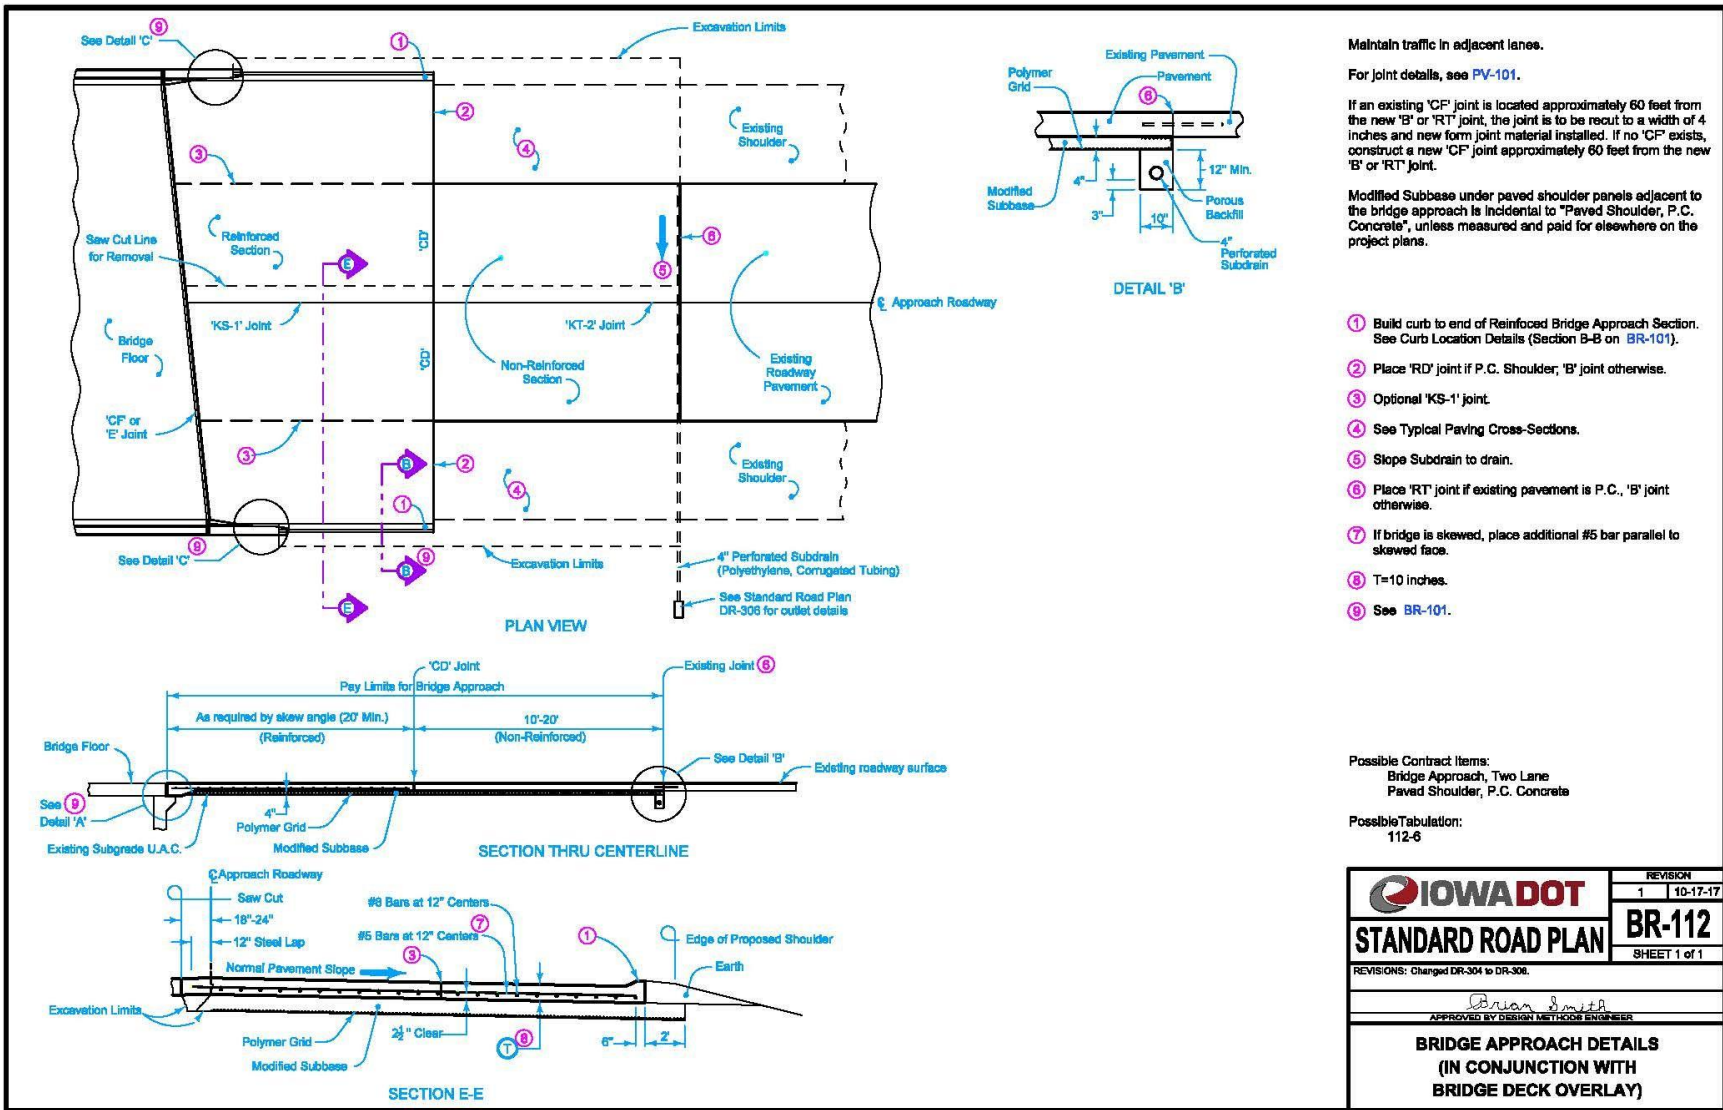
Iowa DOT Standard Road Plan BR-112 – Bridge Approach Details (in Conjunction with Bridge Deck Overlay) [68]
